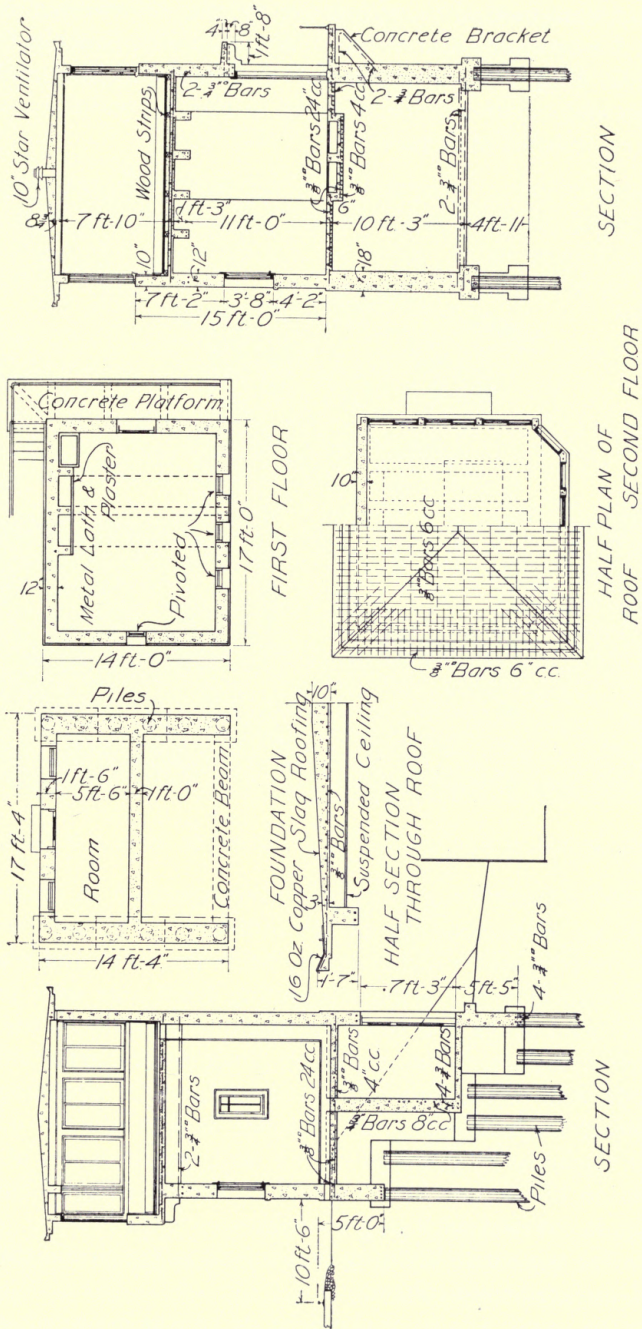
DETAILS OF CONSTRUCTION, GROVE ST. SIGNAL TOWER, D., L. & W. R. R.
